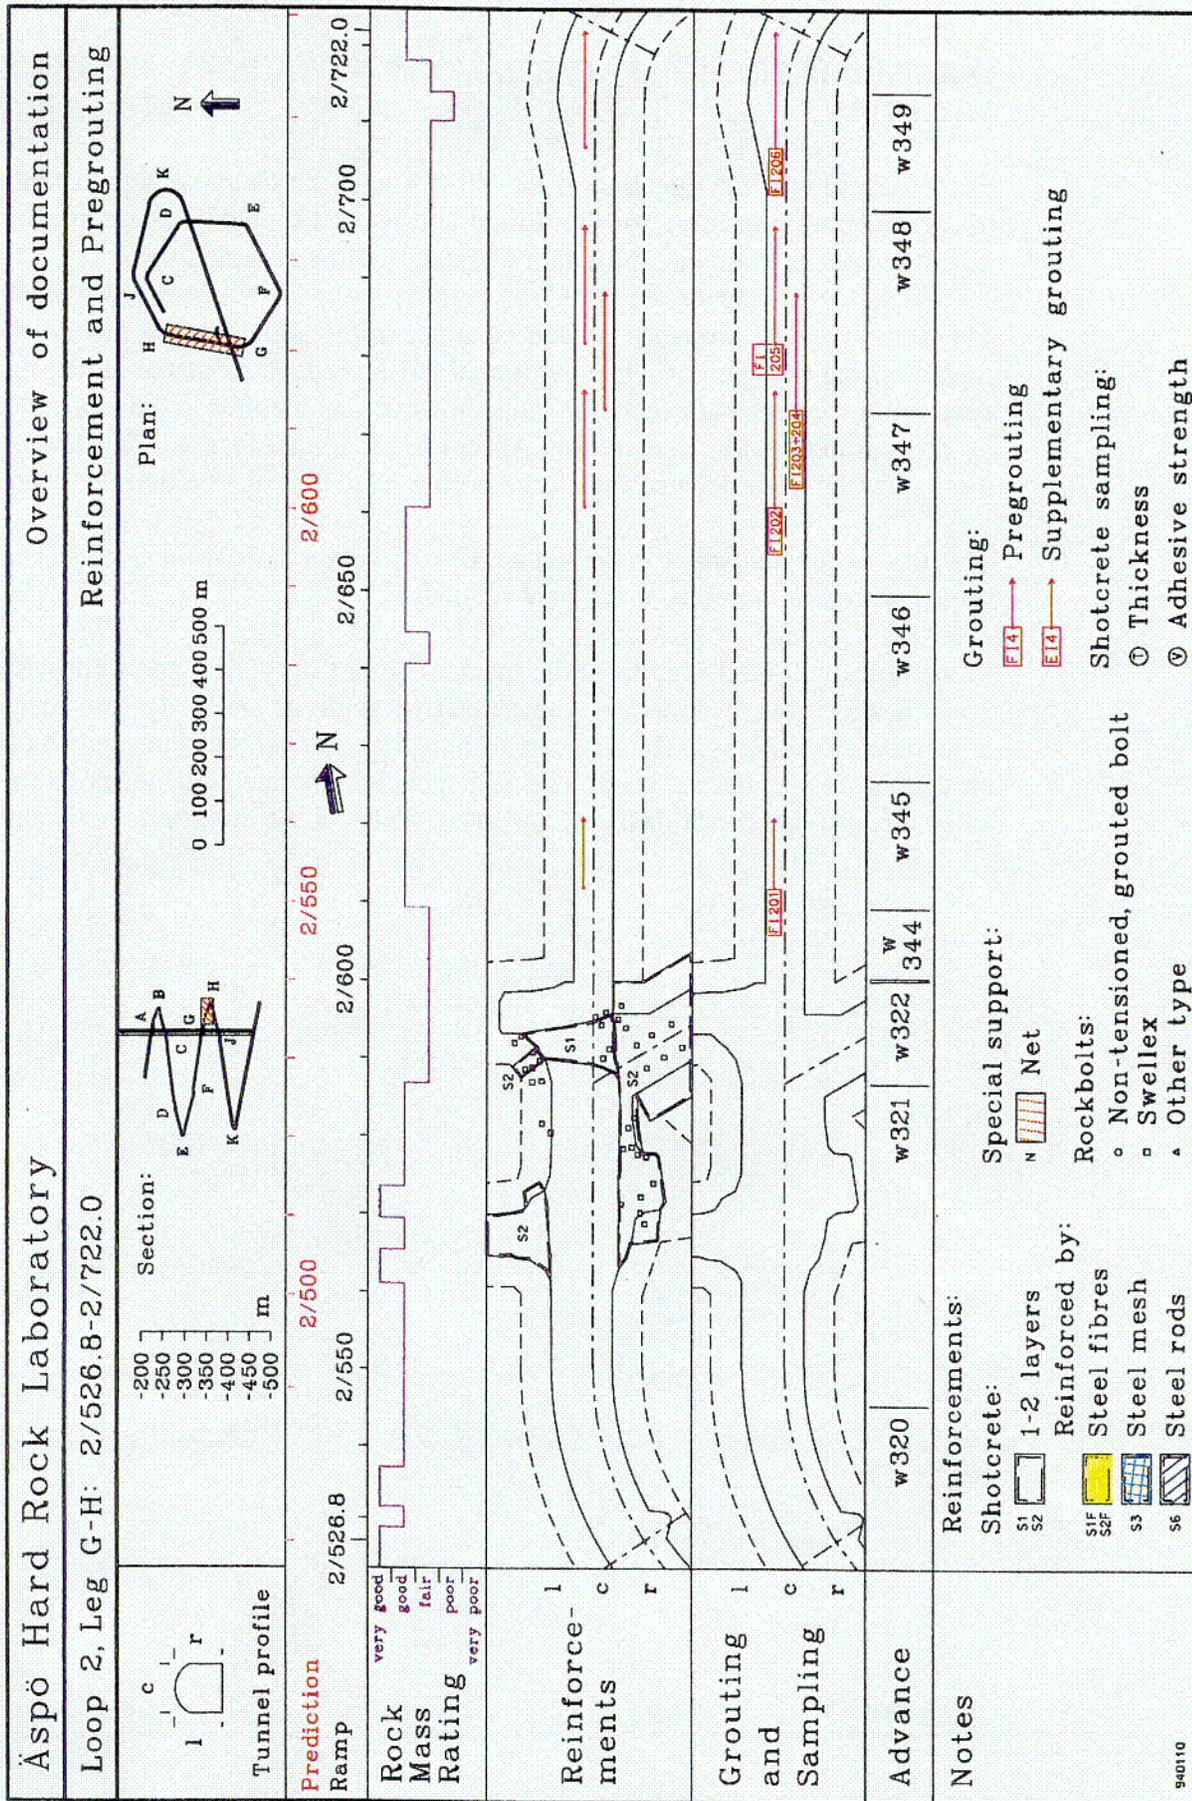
Reinforcement and pregrouting, tunnel section 2526-2722 m.
